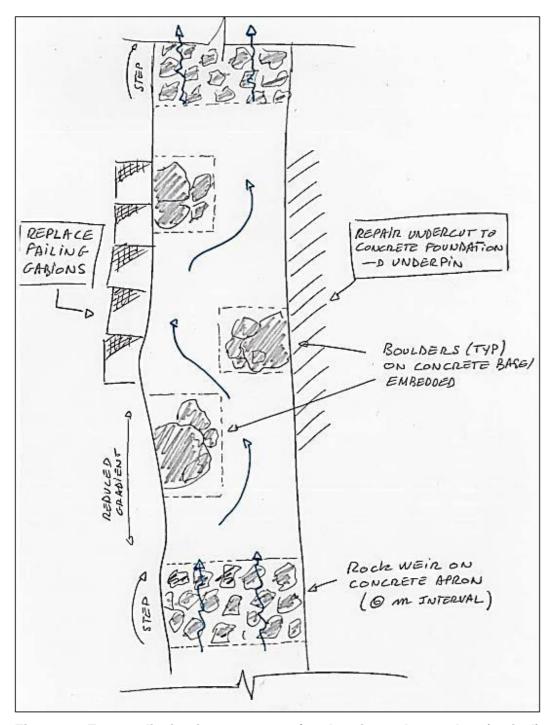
Energy dissipation structures / rock weirs and meanders (typical)
